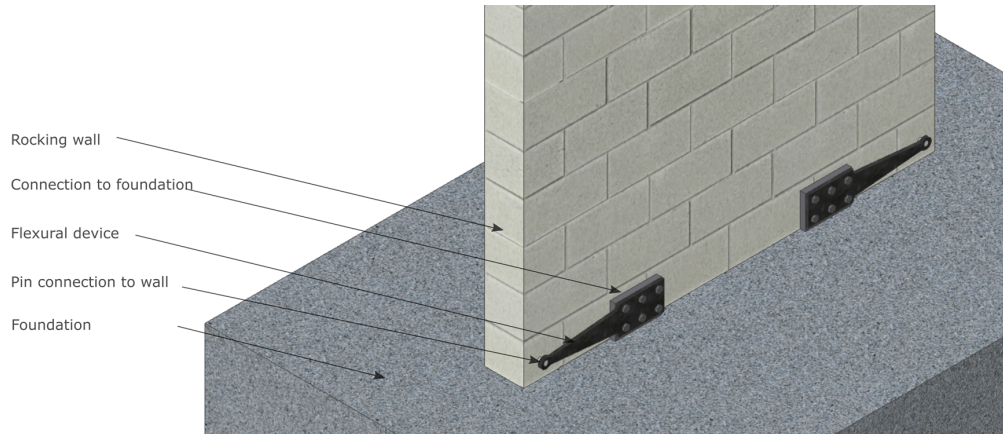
Flexural arms connected to a controlled rocking masonry wall
